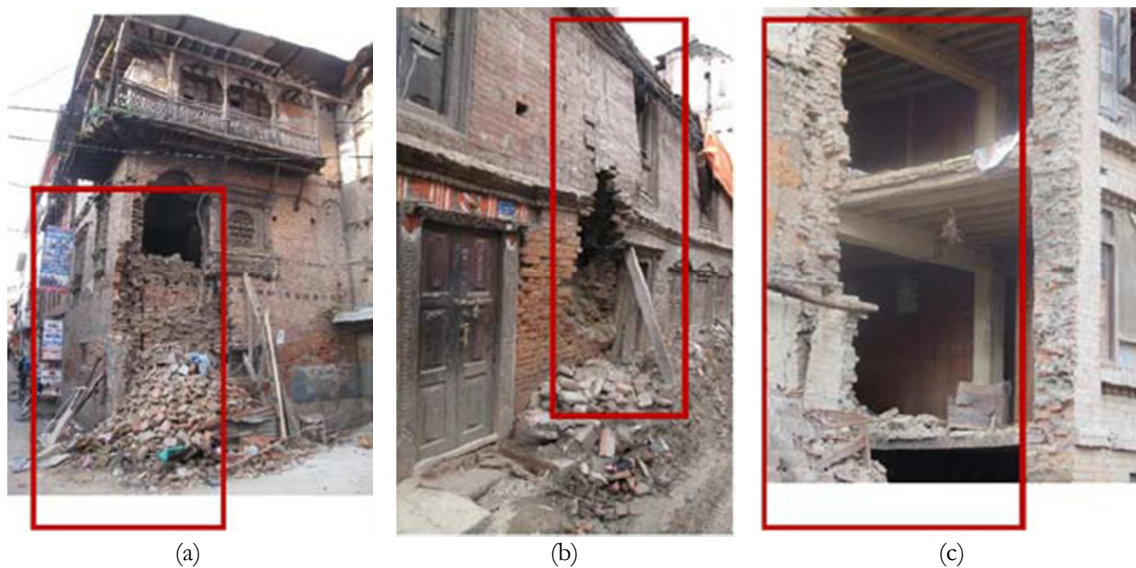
URM earthquake damages and failure modes; (a) Out-of-plane collapse of the façade wall and insufficient connection between timber floor and the masonry walls, (b) Out-of-plane collapse of façade wall with bulging of exterior walls, and (c) Insufficient connection between the floors and the masonry walls and out-of-plane collapse of the façade wall of a 3-storey building
